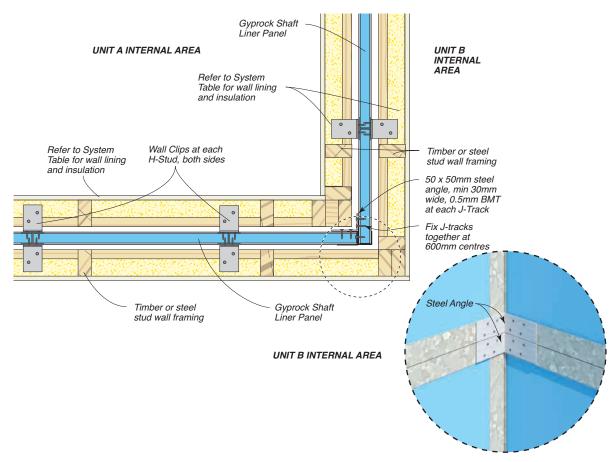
Junction Of Party Wall to Party Wall at T-Intersection (Option 1) - Plan View
